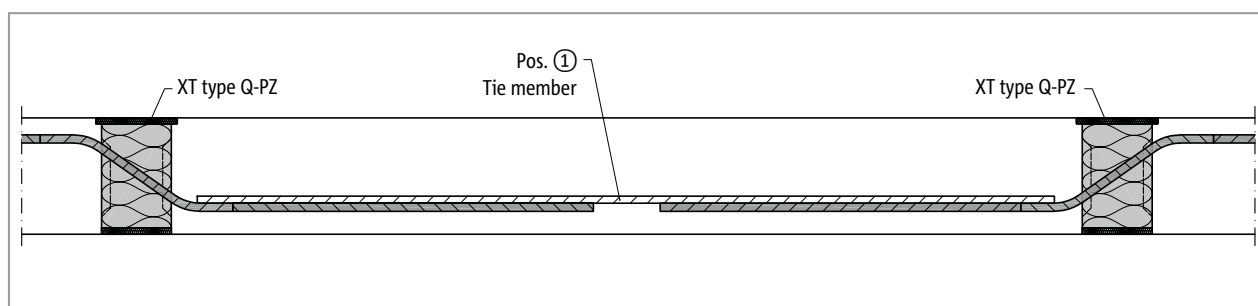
Schöck Isokorb® XT type Q-PZ: Layout of recessed balcony - symmetrical
